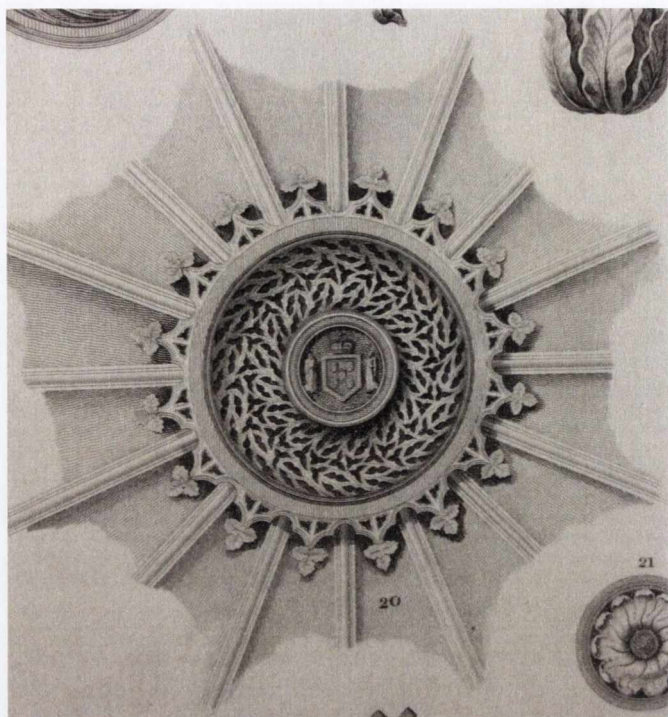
Detail of roof boss from 'Ornaments and motos' [sic], from *Plans, elevations, sections, and views of the church of Batalha* (1795).
